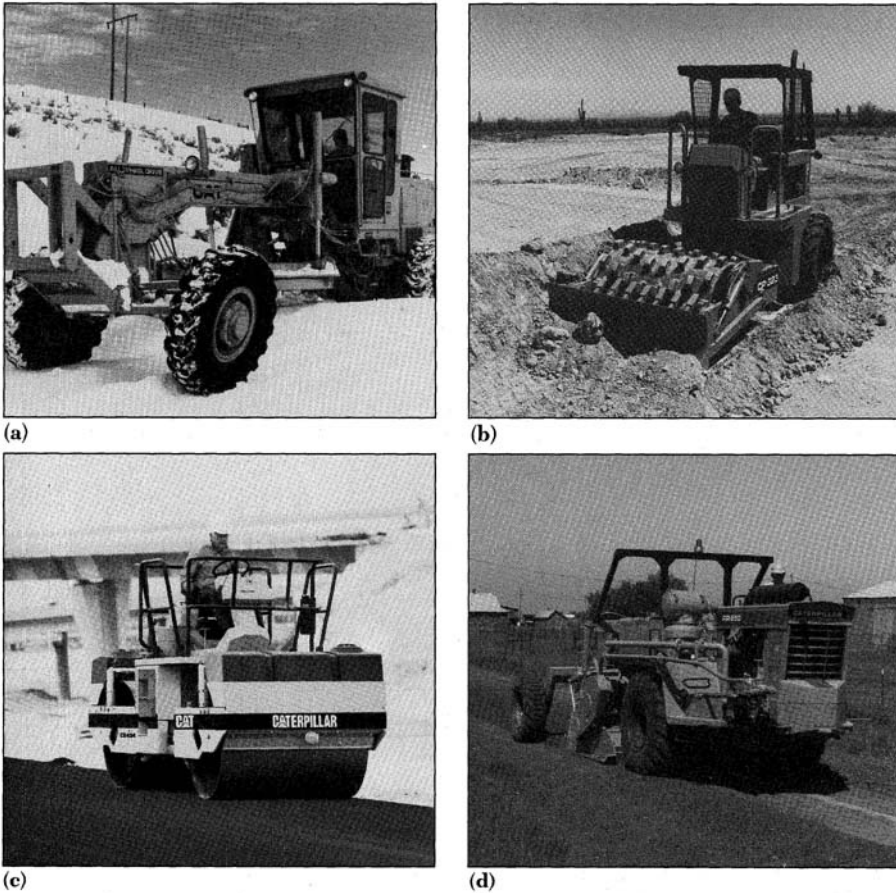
Examples of equipment used for hauling and compacting fill materials: (a) motor grader spreading and preparing fill subgrade; (b) tamping foot roller and compactor; (c) drum on smooth-wheel roller; and (d) self-propelled rubber-tired roller. (Courtesy of Caterpillar Inc., Peoria, IL.)
